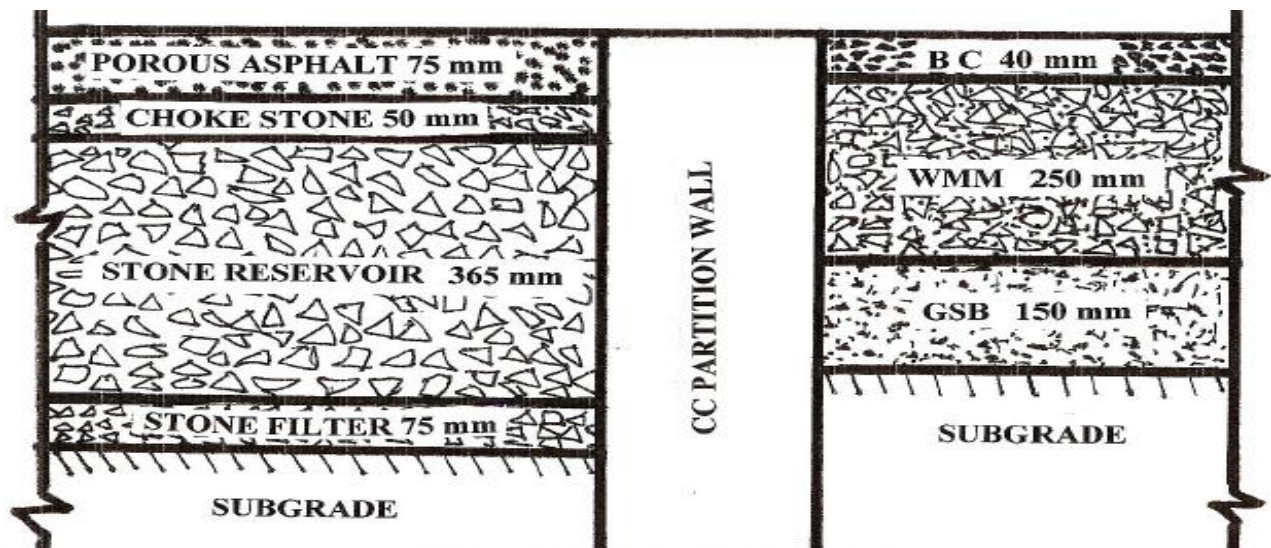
Porous Pavement(Left) & Normal Pavement(Right)
